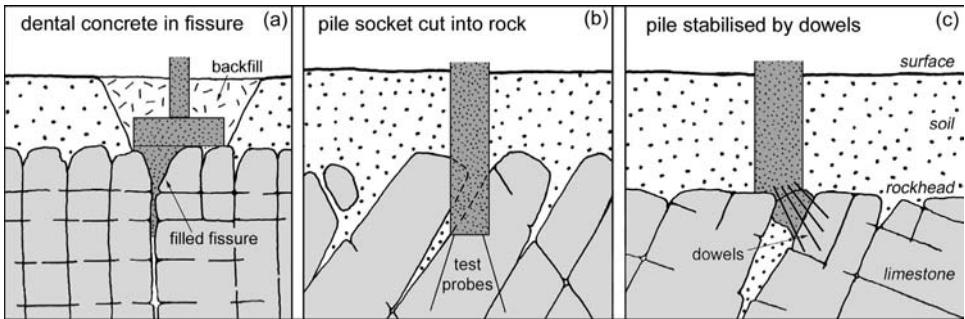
Pile integrity in karst achieved by treatment of rockhead fissures: (a) dental concrete filling in a wide fissure; (b) pile socket cut into rock and probed beneath; (c) pile stabilised by dowels through concrete fill.
